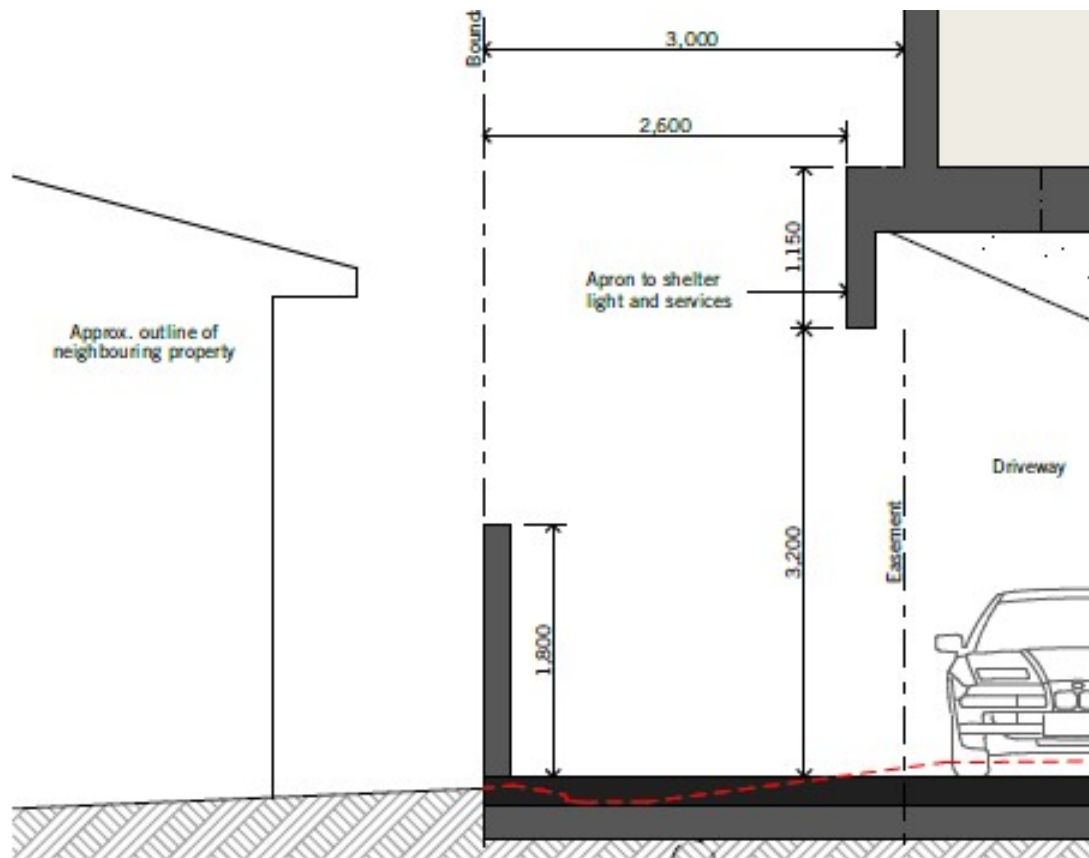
Subject site and ground floor interface to northern property (Source: Lightwave Architecture)
